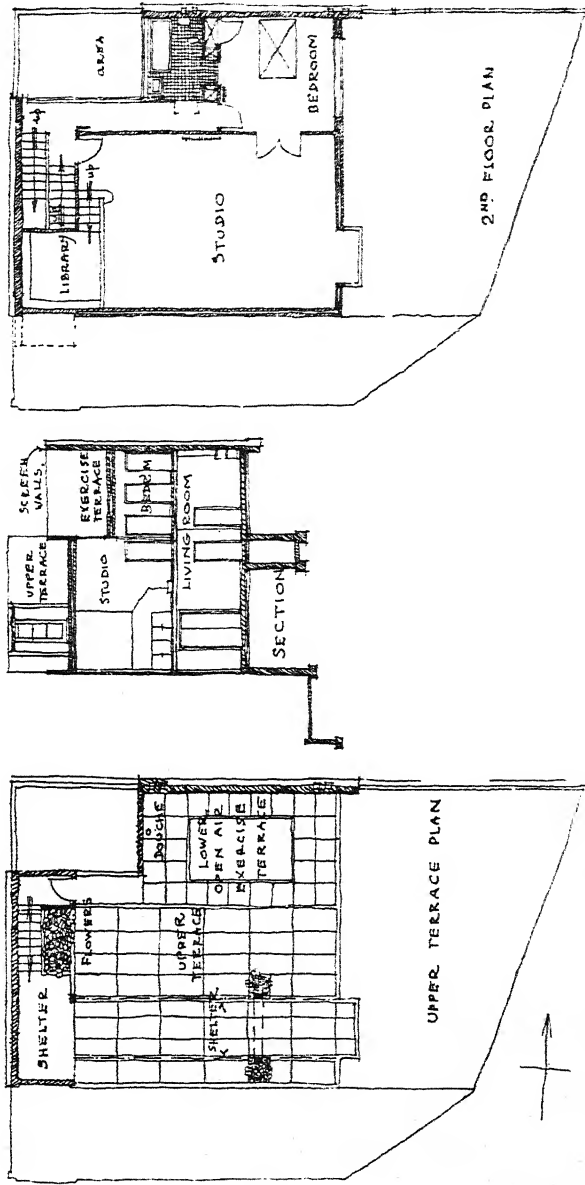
Bedroom floor plan, section, and upper terrace plan of a house in Paris by André Lurçat. The upper roof terrace provides a sunken private exercise ground accessible by stairs from the bedroom and screened from neighbouring houses.
